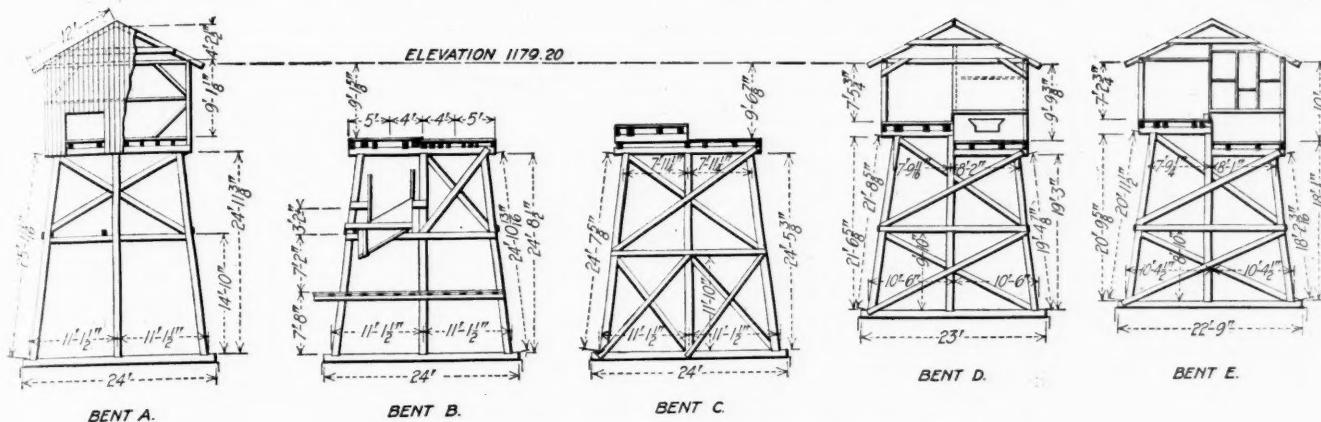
CONSTRUCTION DETAILS OF THE TIPPLE
